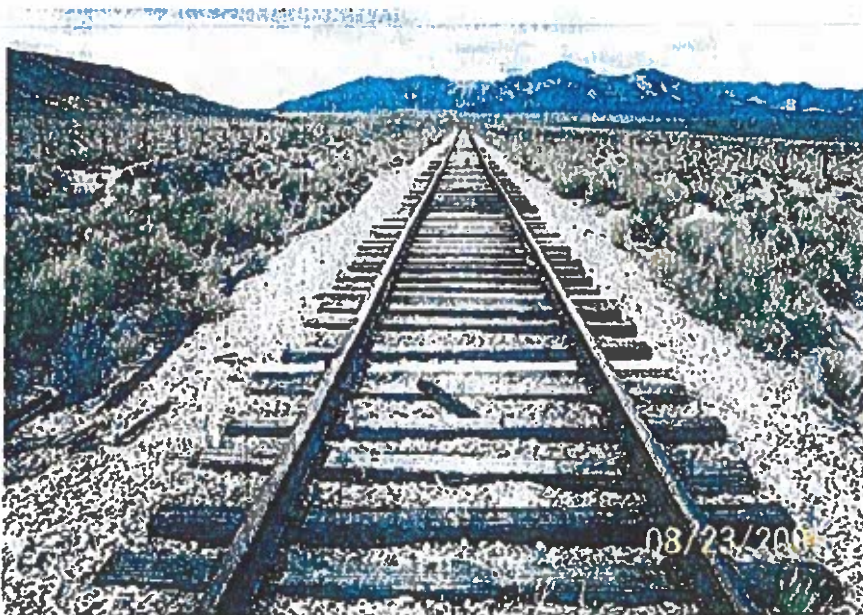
Mile Post 63, Looking South, 90# Rail Approaching Curves to South
